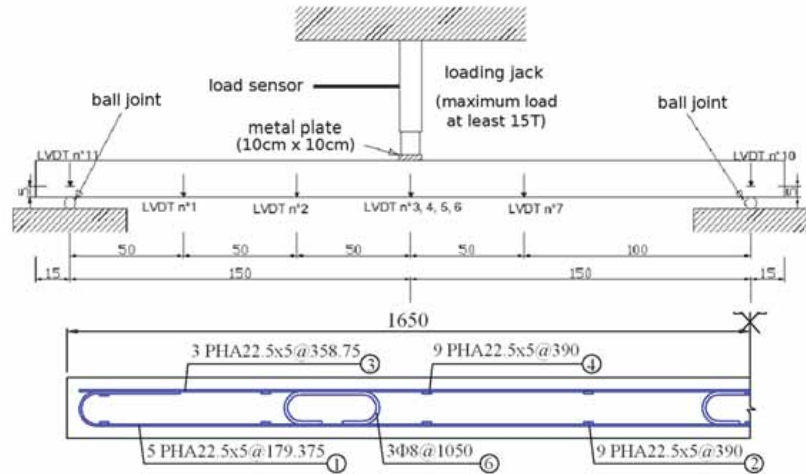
Slab-beam dimensions, type of reinforcement and loading conditions
